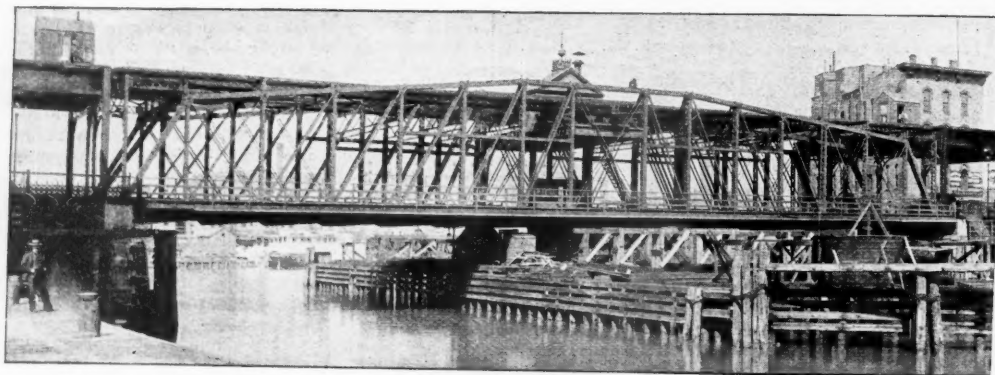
Tracks of the Lake Street Elevated Railroad Company on Lake Street Bridge.
